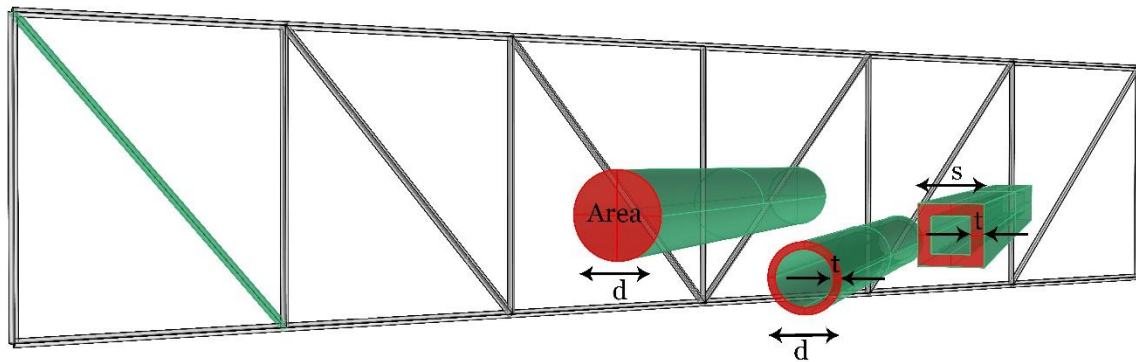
Examples of size design variables of trusses (i.e. frame structures)
